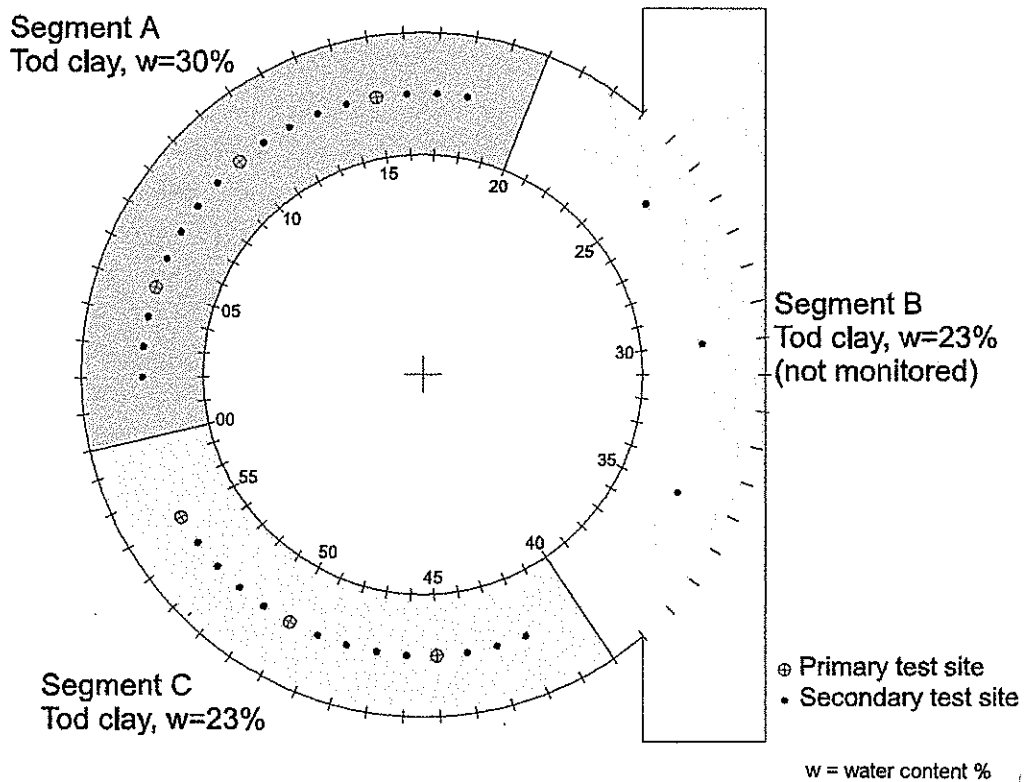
Plan view of the CAPTIF test subgrade layout.
